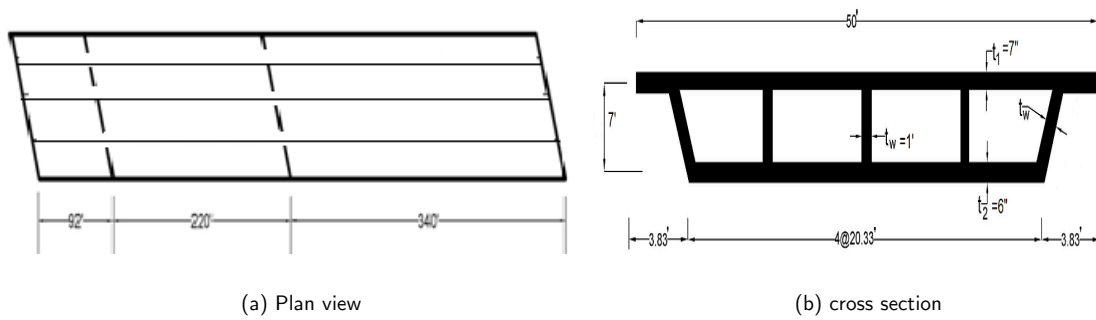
Plan View and Cross Section of Bridge No. 14 of comparative model (Huo et al., 2003)
